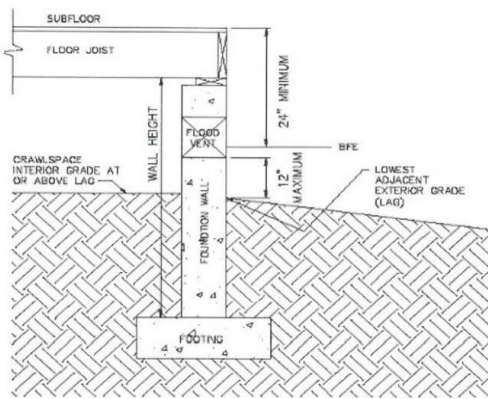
Preferred Crawl Space Construction⁷⁷
